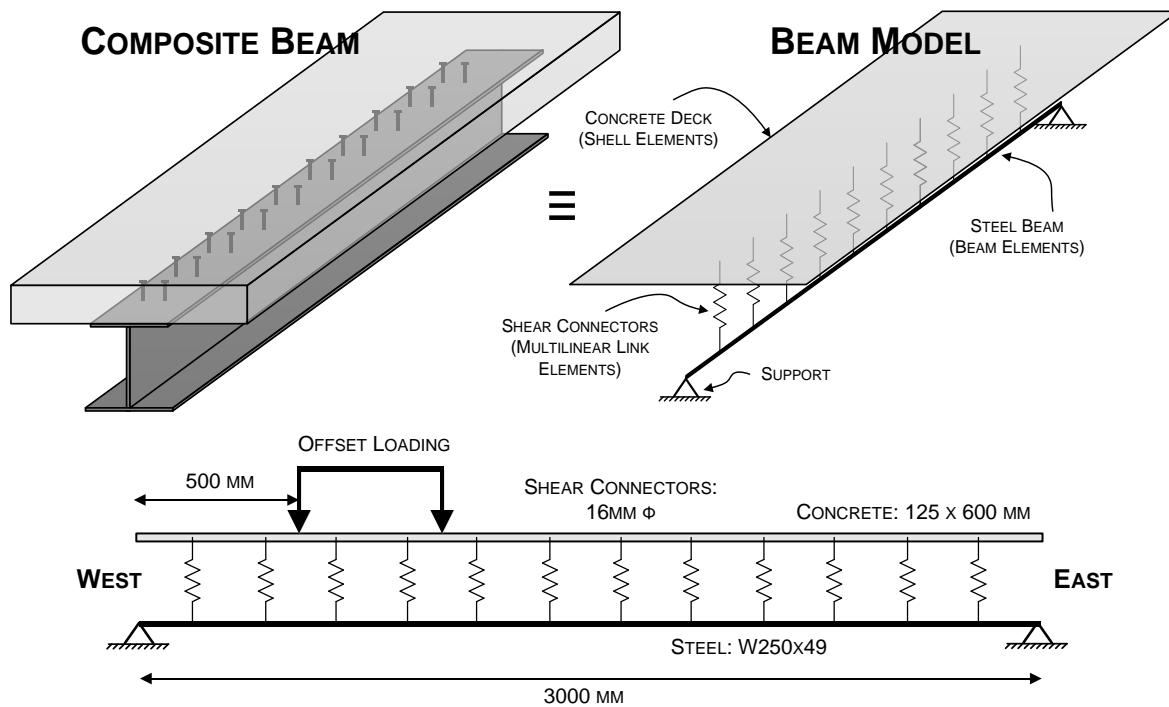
FE beam model showing element types, geometry, and loading setup.
